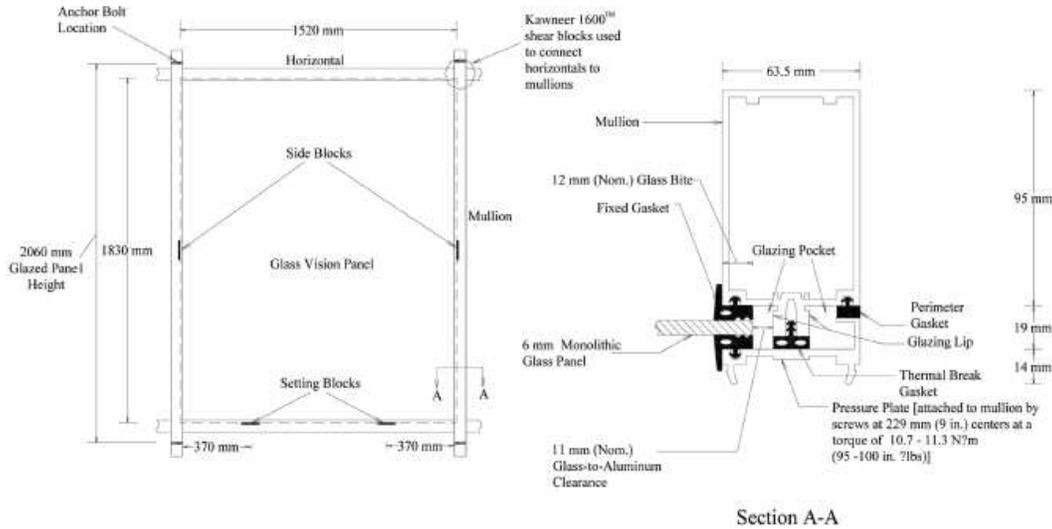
General glazing details for curtain wall mock-up test (Memari et al. 2007)
